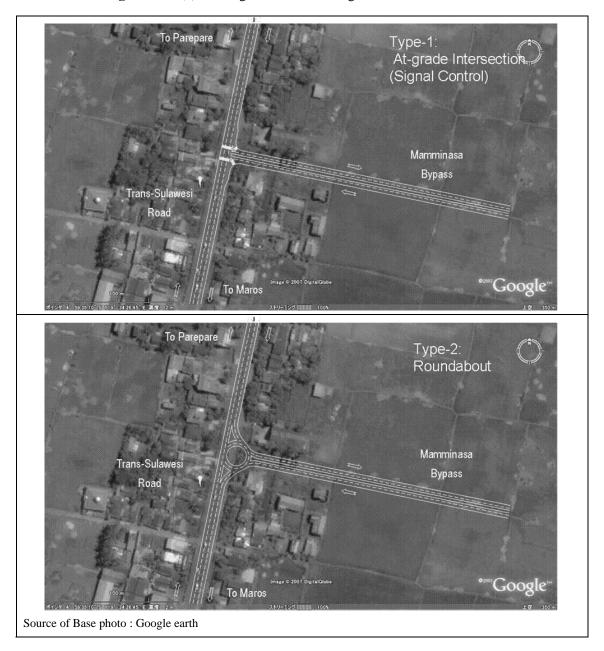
(2) Alternative Intersection Plans for TS-8 IC
